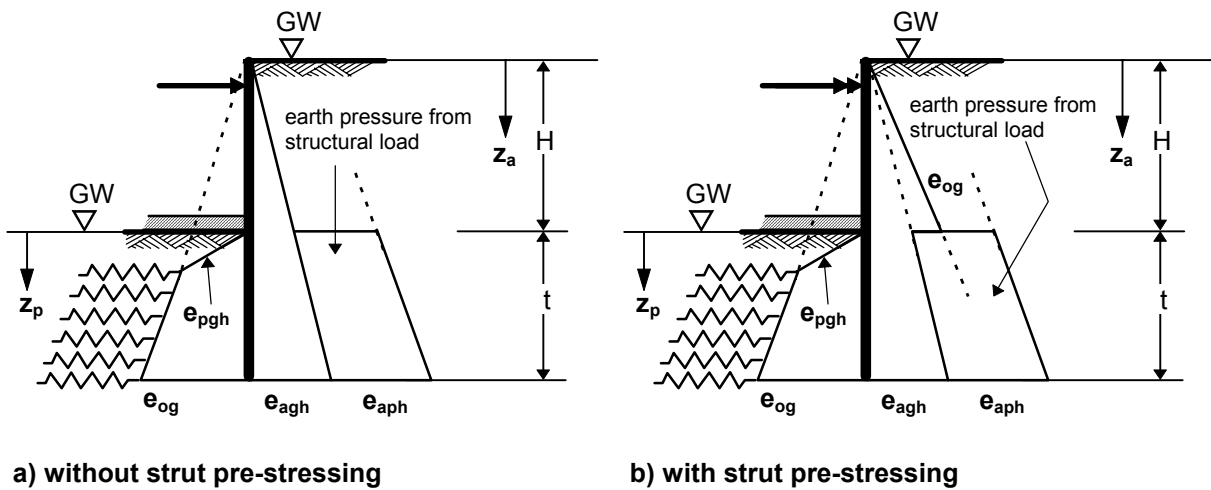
Possible load diagram for a wall supported by a strut at the top and by stepwise installed bottom slab
